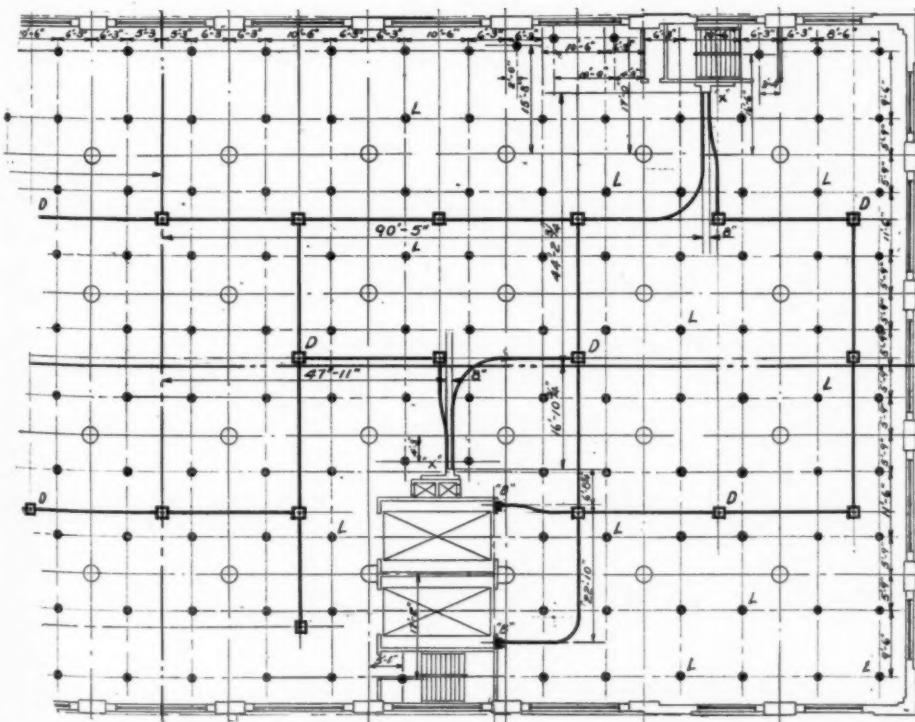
Same Corner of Building as in Fig. 4 Showing Layout of Distribution Conduit
